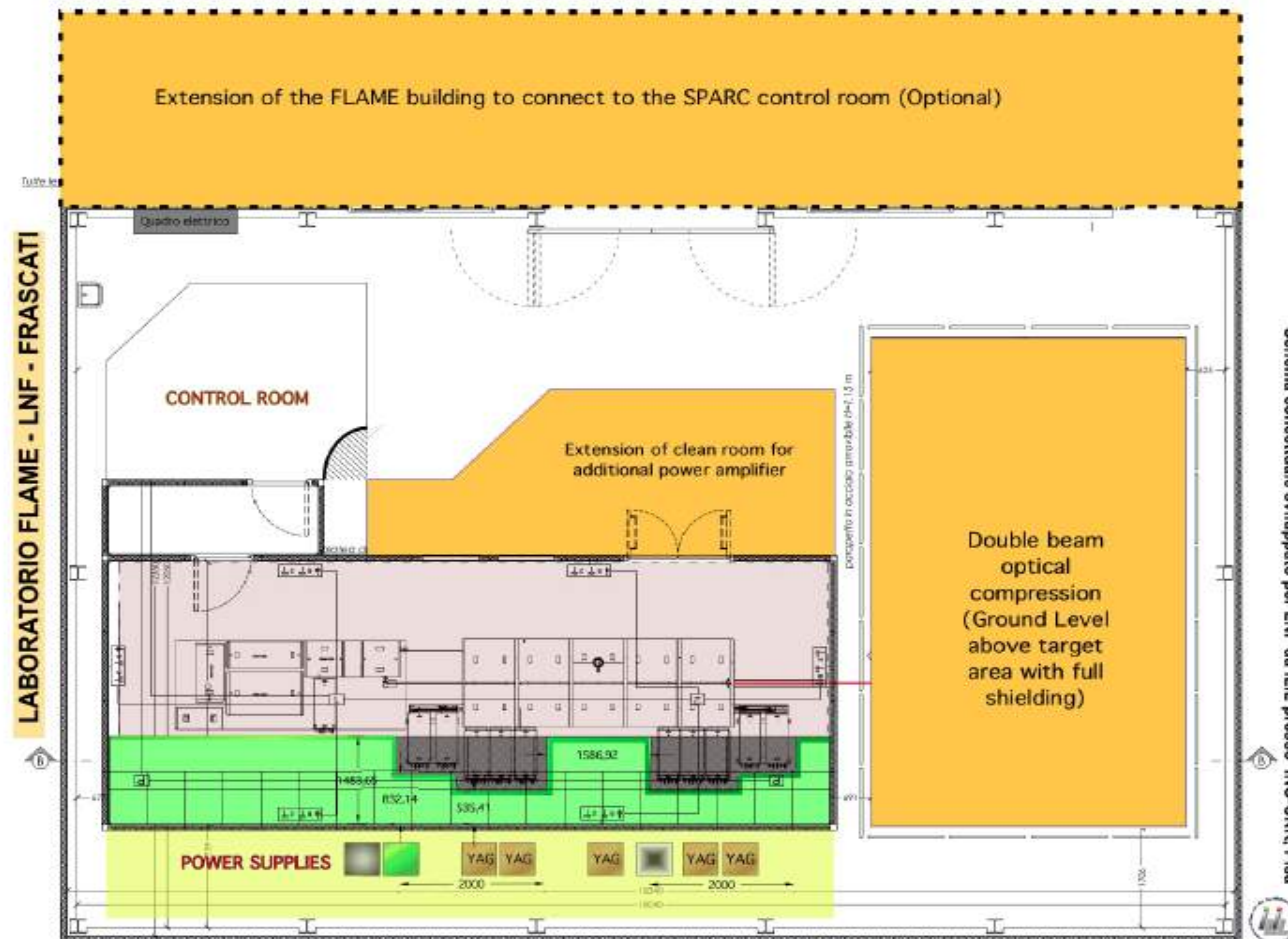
Layout of the upgraded Flame building, with the ground floor layout including the extension of the clean room and the dual compressor room. An optional extension of the Flame building is also planned to allow a better connection with the present Sparc control room building.
